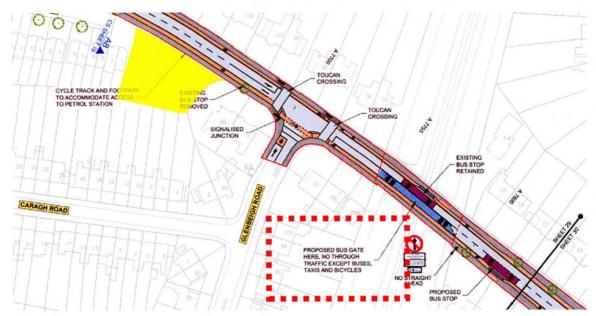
Extract from Sheet 29 of the General Arrangement drawing illustrating the proposed bus gate (red dashed line) relative to our client's site (yellow fill).
